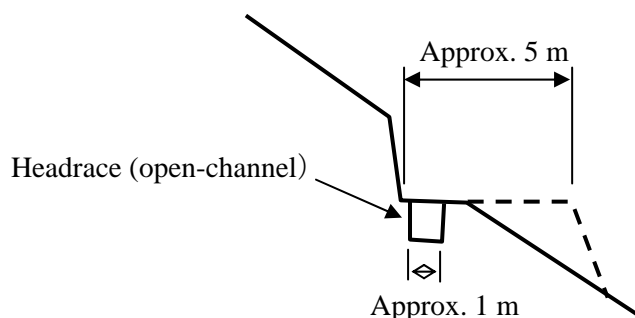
Cross Section of Headrace for Djardy-Kainda Site
